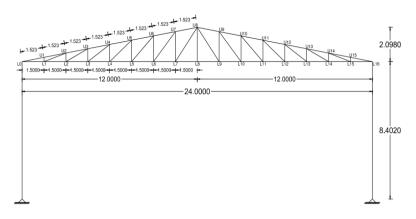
Elevation of Warehouse Structure IV. LOADING CALCULATIONS
